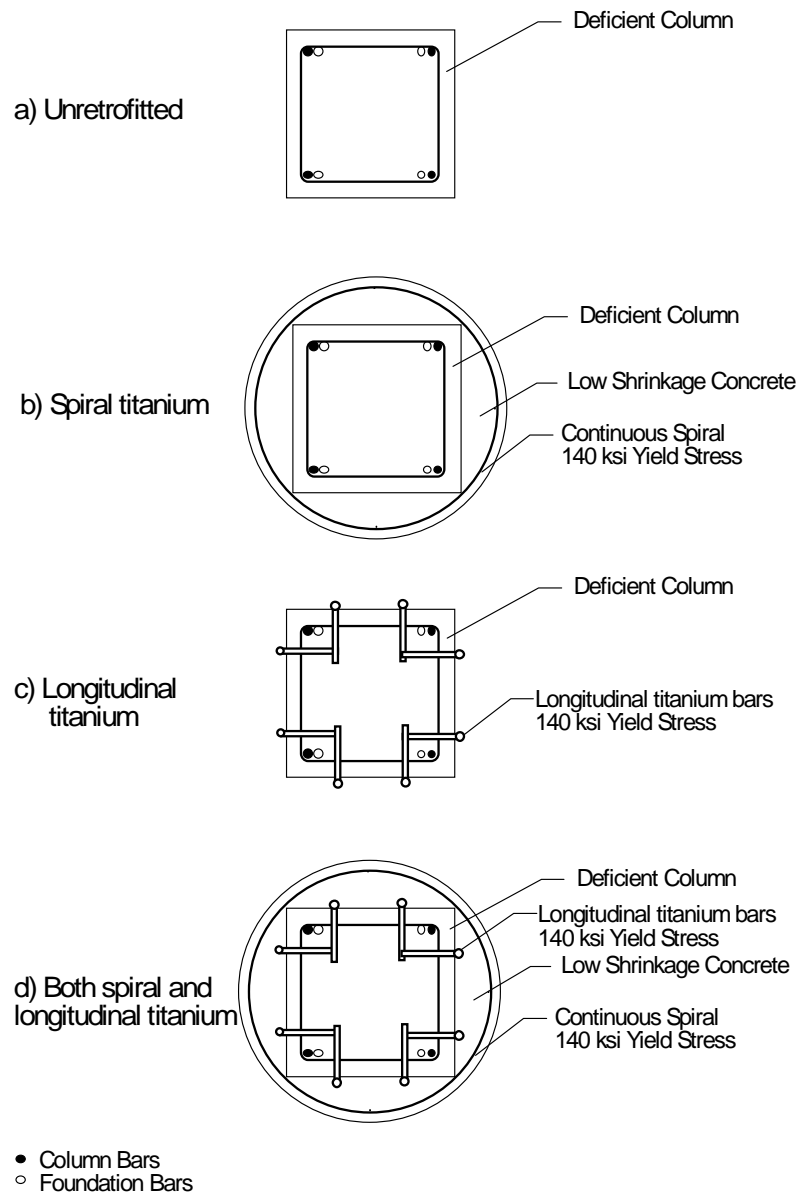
Example specimen cross-sections at splice location above footing elevation.
